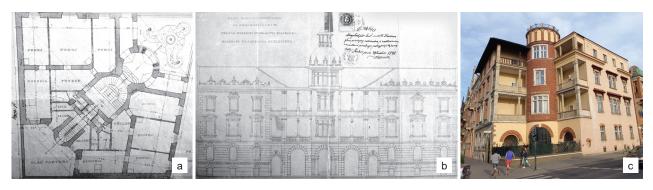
Kraków, townhouse at 40 Piłsudskiego Street / 25 Krasińskiego Street (designed by W. Ekielski, 1898–1899): a) ground floor plan (source: ANK, ABM Piłsudskiego 40, fsc. 447), b) façade (source: ANK, ABM Piłsudskiego 40, fsc. 447), c) photograph from 2024 (photo by B. Makowska)
